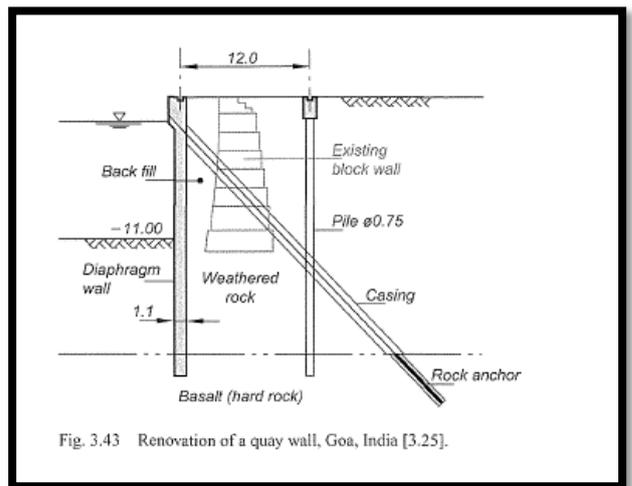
Renovation of a quay wall, Goa, India [3.25].
